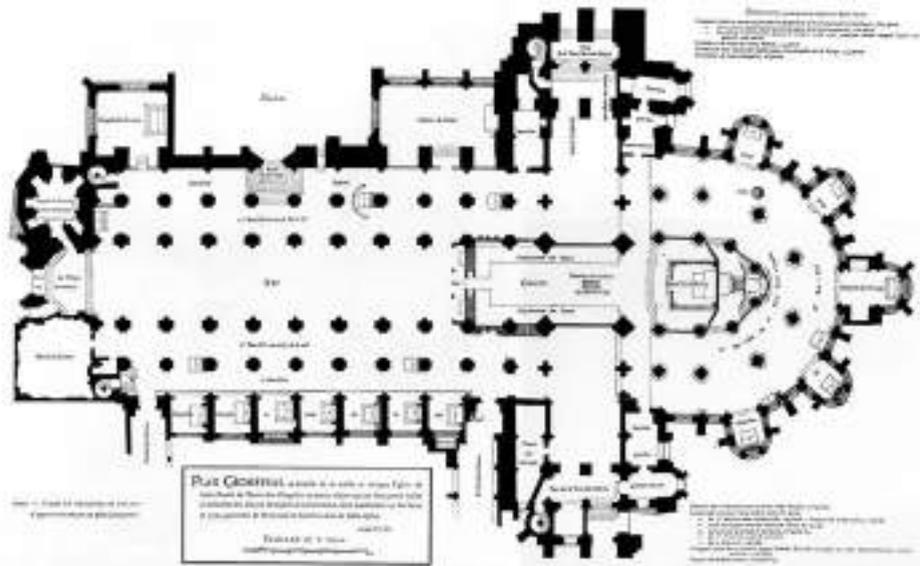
Saint-Martin de Tours, Plan Jacquemin, 1779, ground plan of the abbey church.
